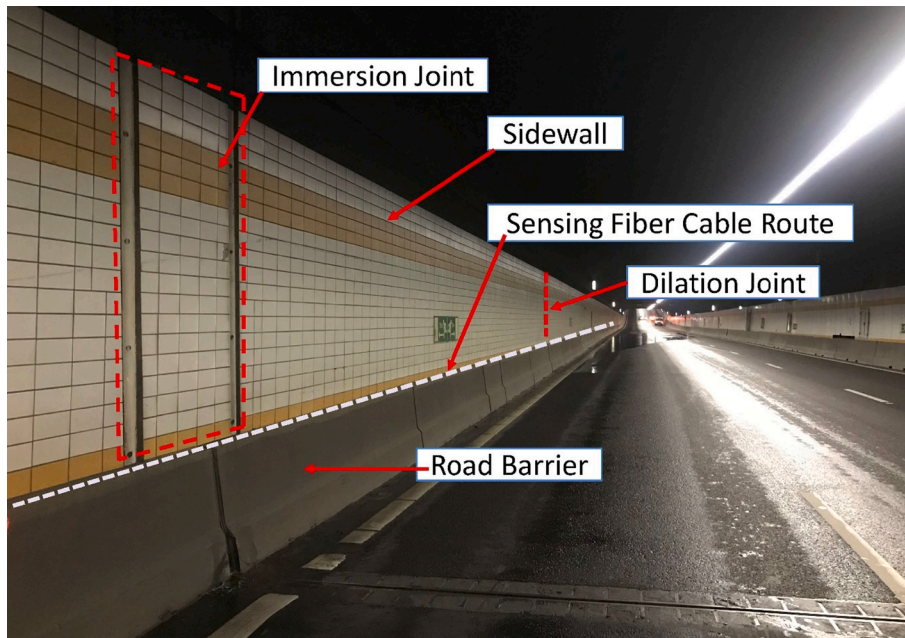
Sidewall of west tube to be instrumented by DOFS.
